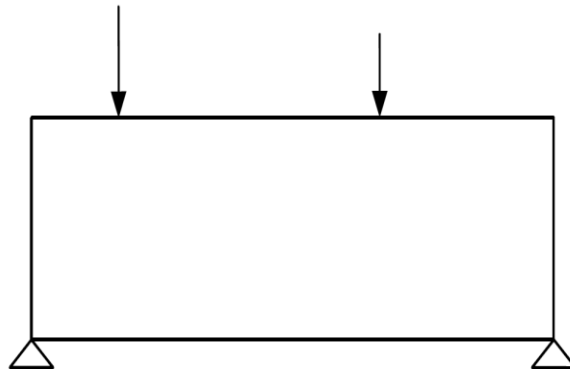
Loading in plane of the solid wood slab element – element of dowel jointed timber boards
